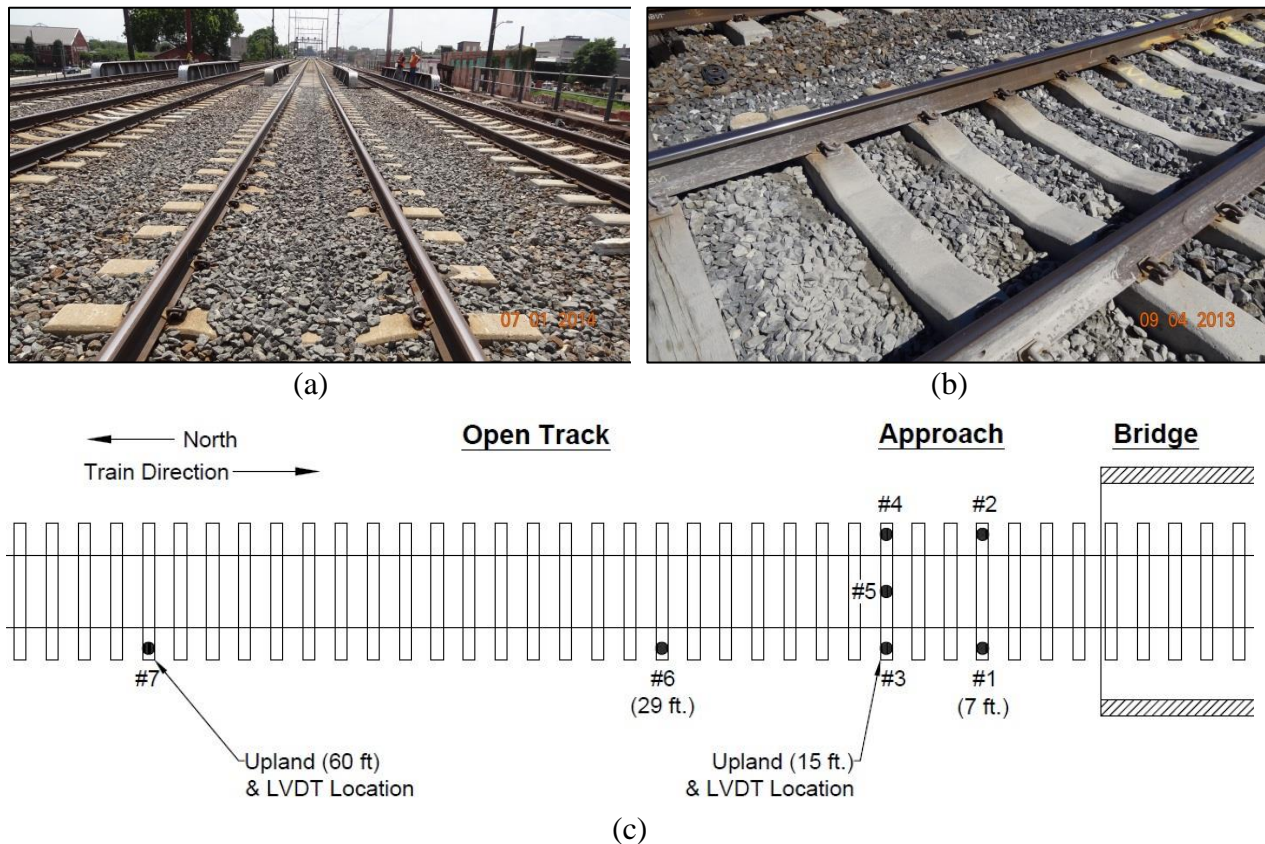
(a,b) Photographs of transition zone and (c) instrumentation layout for Site #5.
